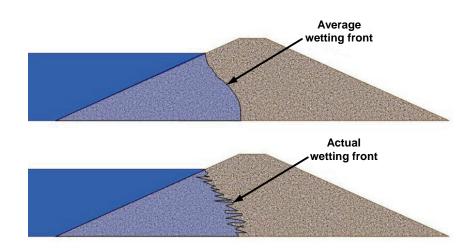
On first filling, a high hydraulic gradient exists in the embankment dam as a wetting front moves through the dam. The wetting front will not be smooth. Projections will exist due to the different permeability of the embankment dam. The water pressure pushing against the soil can easily be greater than the lateral stress, and hydraulic fracture can result. Figure courtesy of ASDSO.
